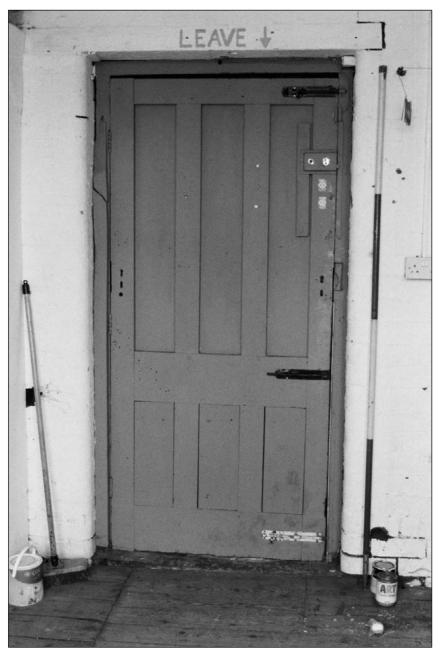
Detail of primary doorway leading to/from external staircase in central yard, north wall of F9, south range (film 26.14)
